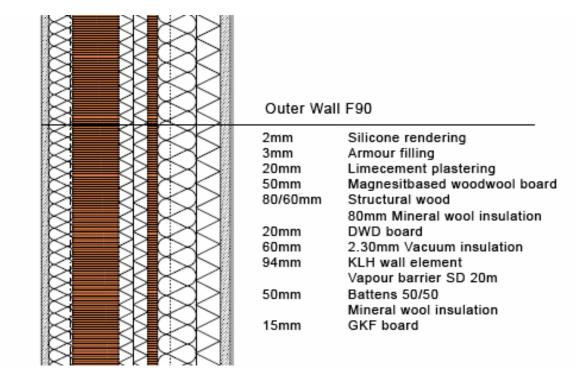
c - Detail: Façade; Dimensions in [mm]
